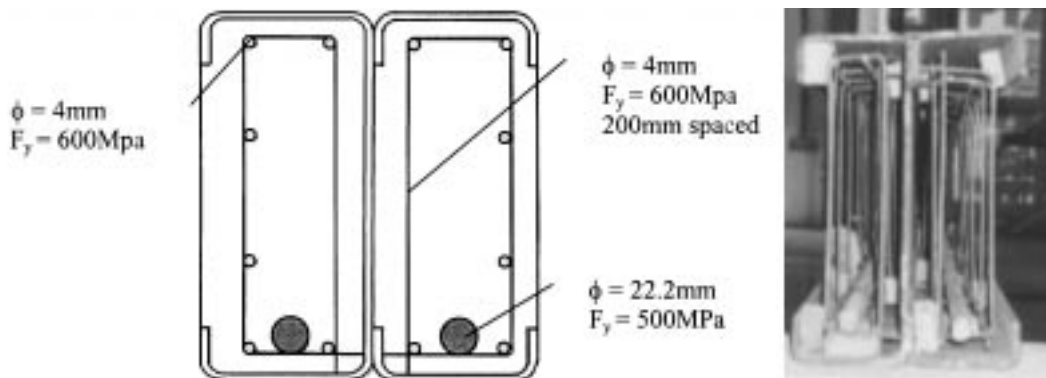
Cross-section reinforcement bars detail used on the second tested beam
